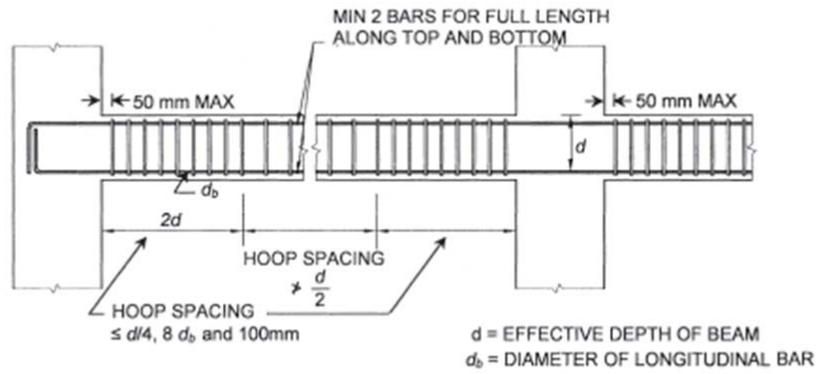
DETAILS OF TRANSVERSE REINFORCEMENT IN BEAMS
